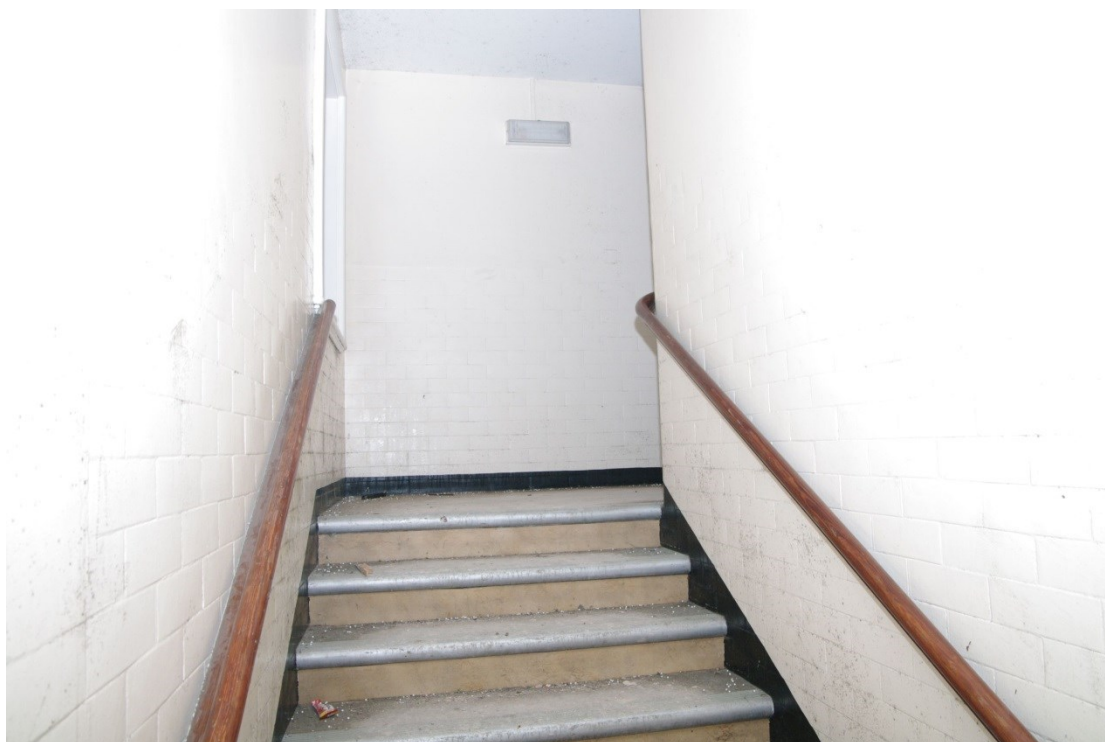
Zone 1 ground floor photo 2. Stairs with pine hand rails
